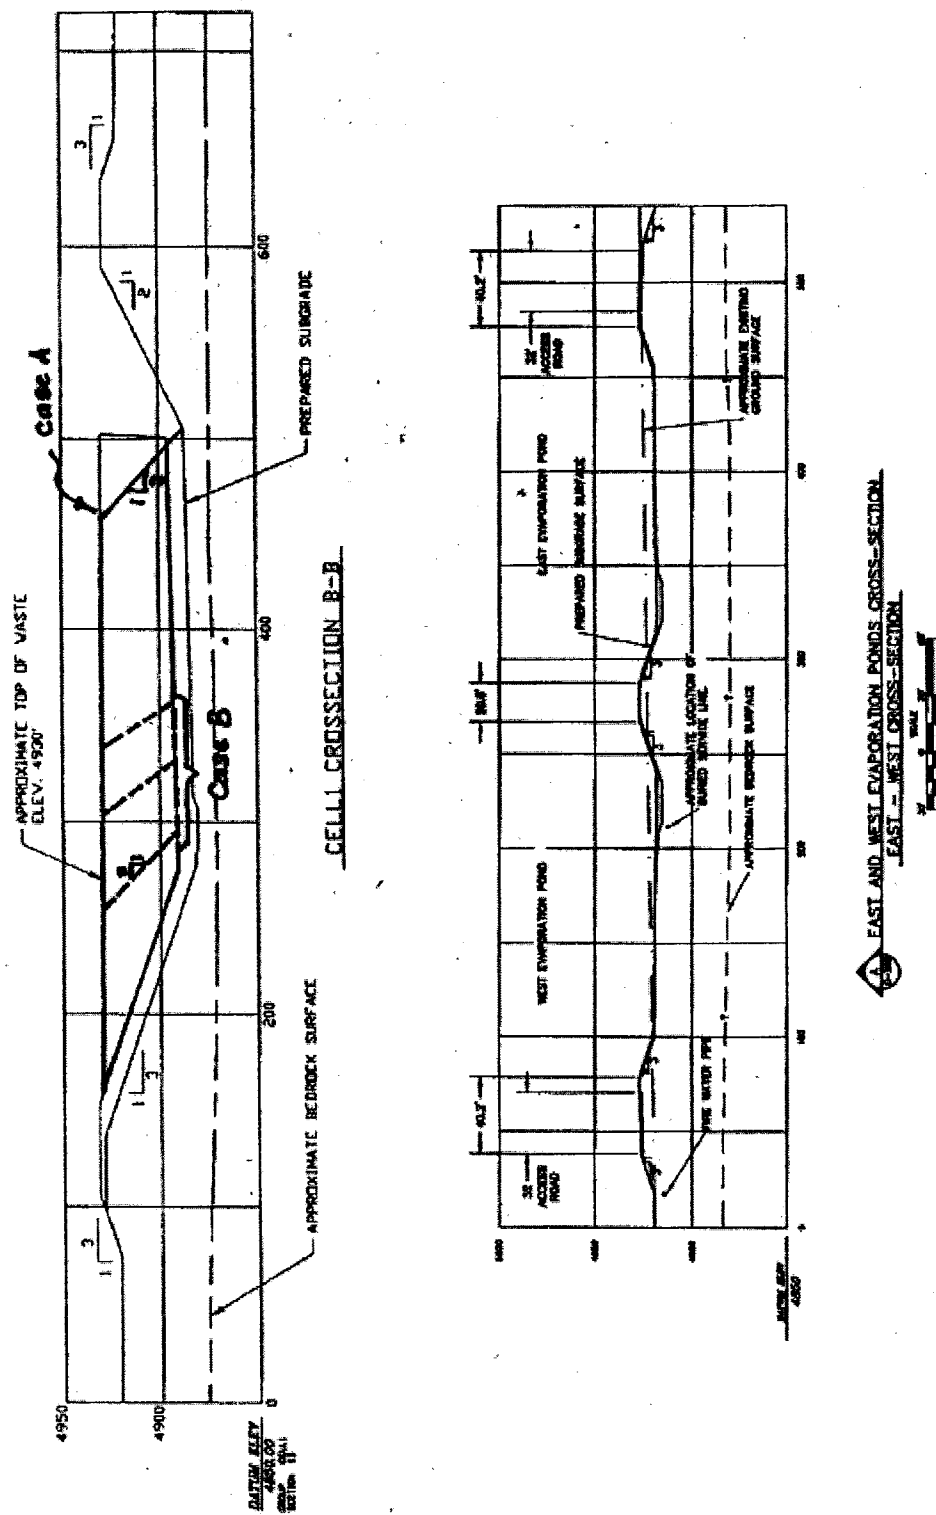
Typical cross-sections for Cell 1 and evaporation ponds.
